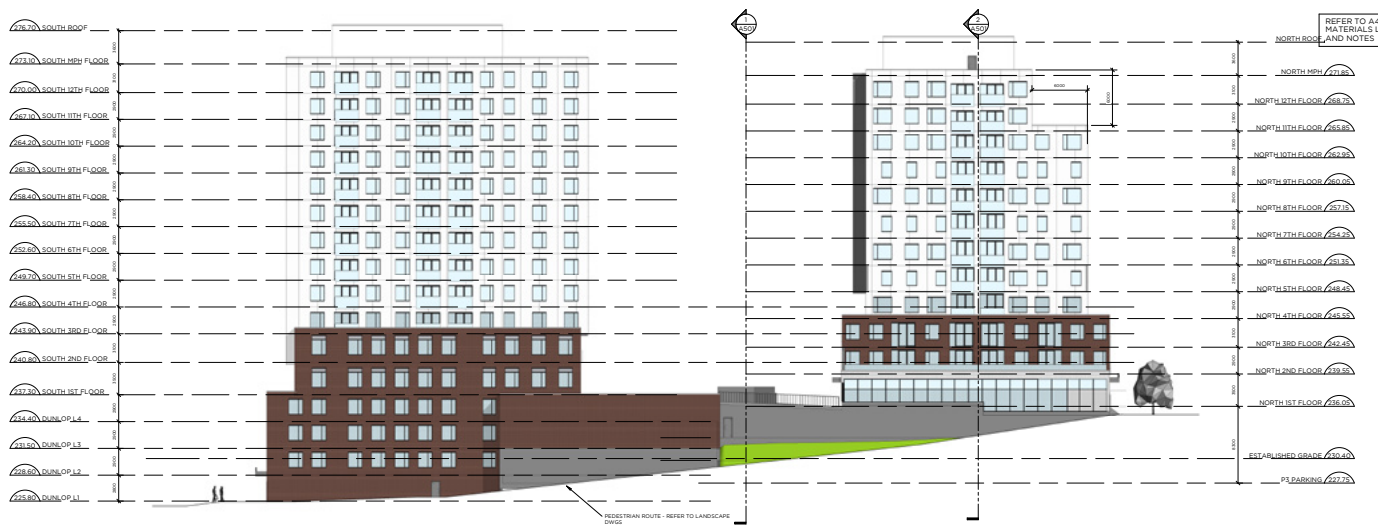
East Elevations illustrating setbacks and height transition toward north (Collier Street)
